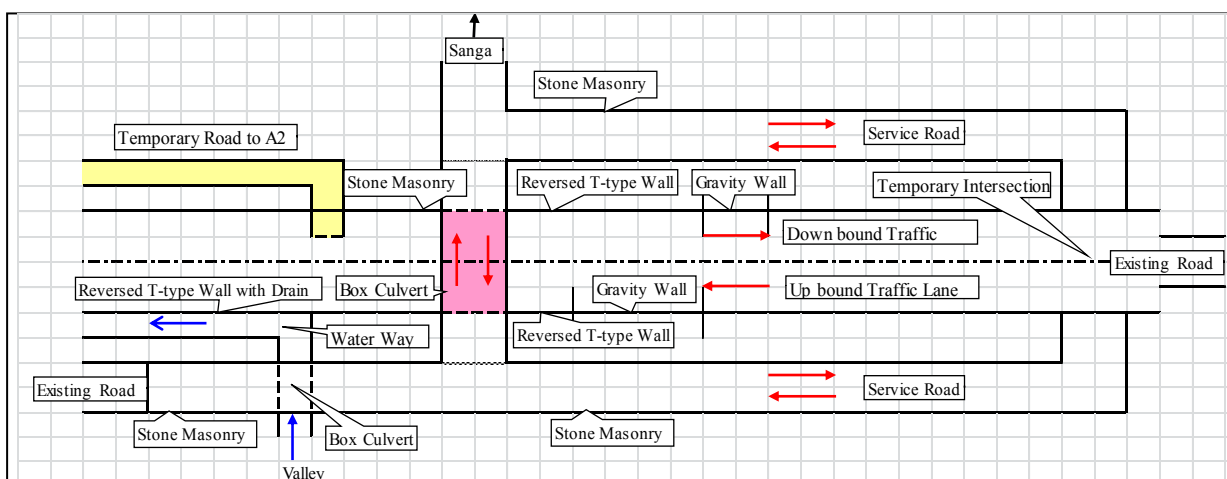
Schematic Diagram of Construction Method at Sanga Pass (Underpass)
